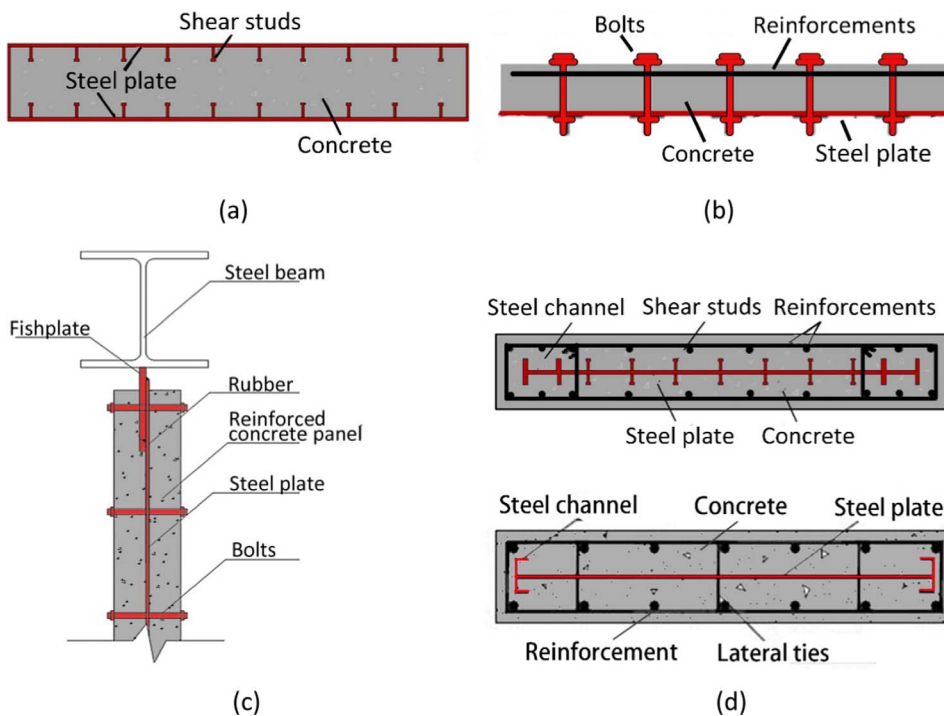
Schematic diagram for steel-concrete composite shear wall. (a) Double skin steel-concrete composite wall; (b) Single skin steel-concrete composite wall; (c) Infill-plate concrete shear wall; (d) Steel plate reinforced concrete shear wall (SPRW).
